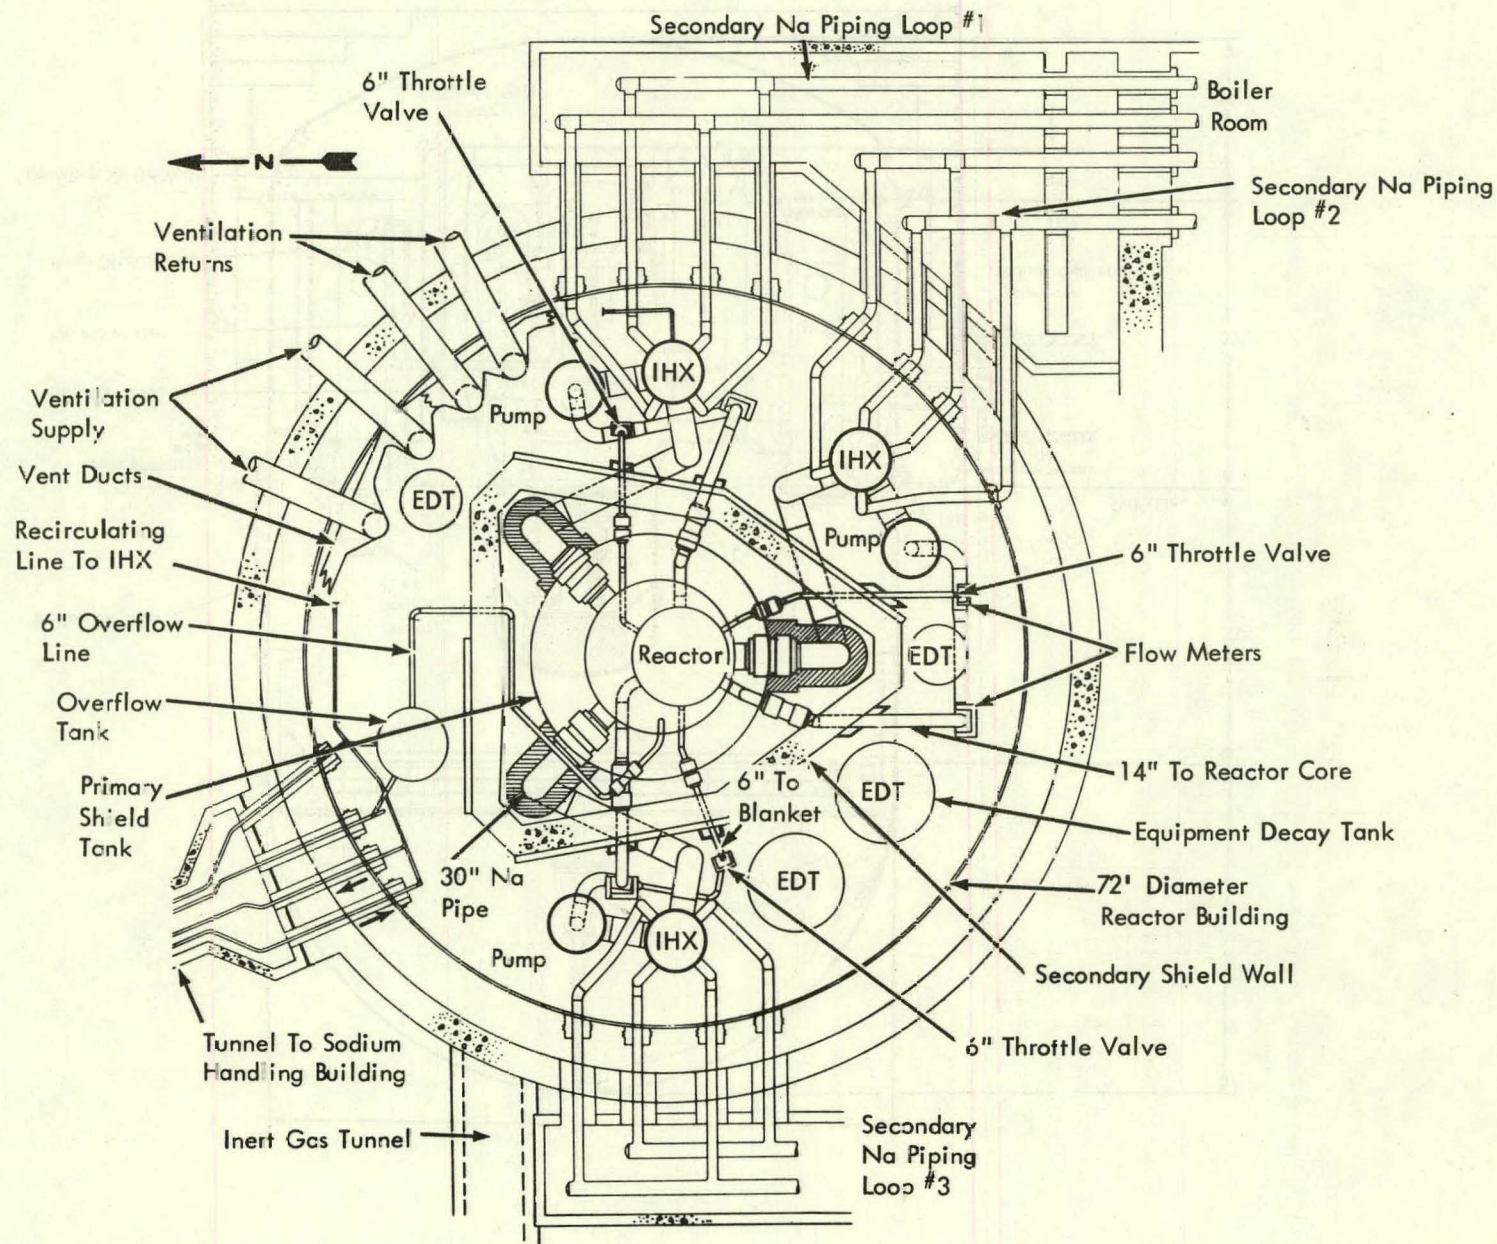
PLAN VIEW OF PRIMARY SYSTEM
